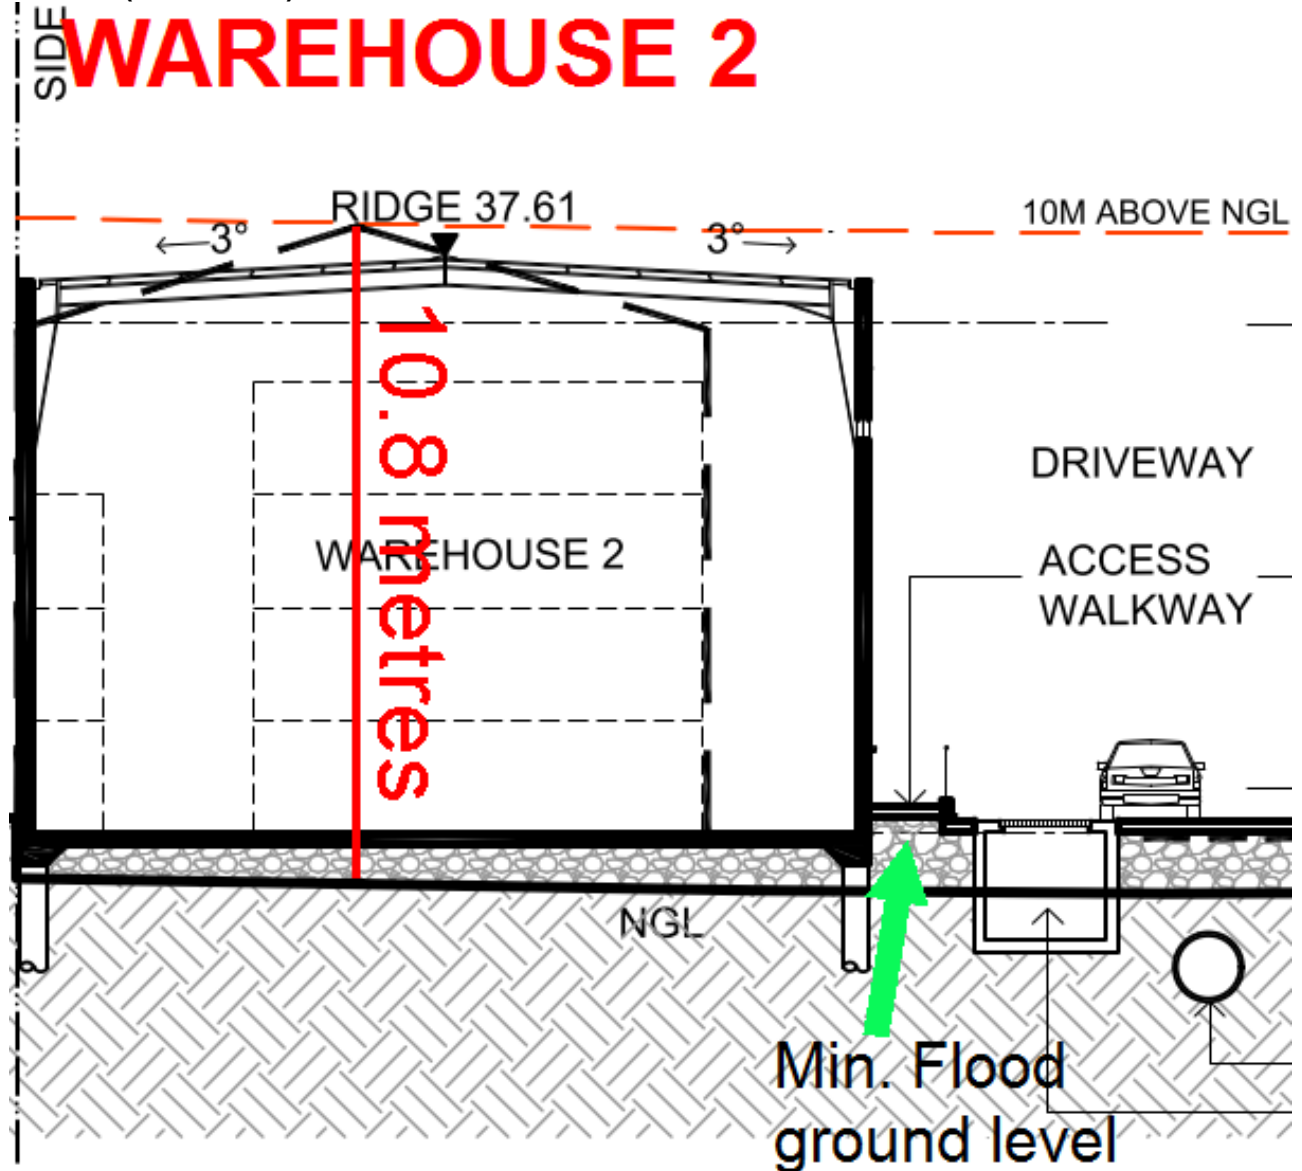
Extract (marked up) from Section B-B showing correct building height for Warehouse 2 at 10.8m
